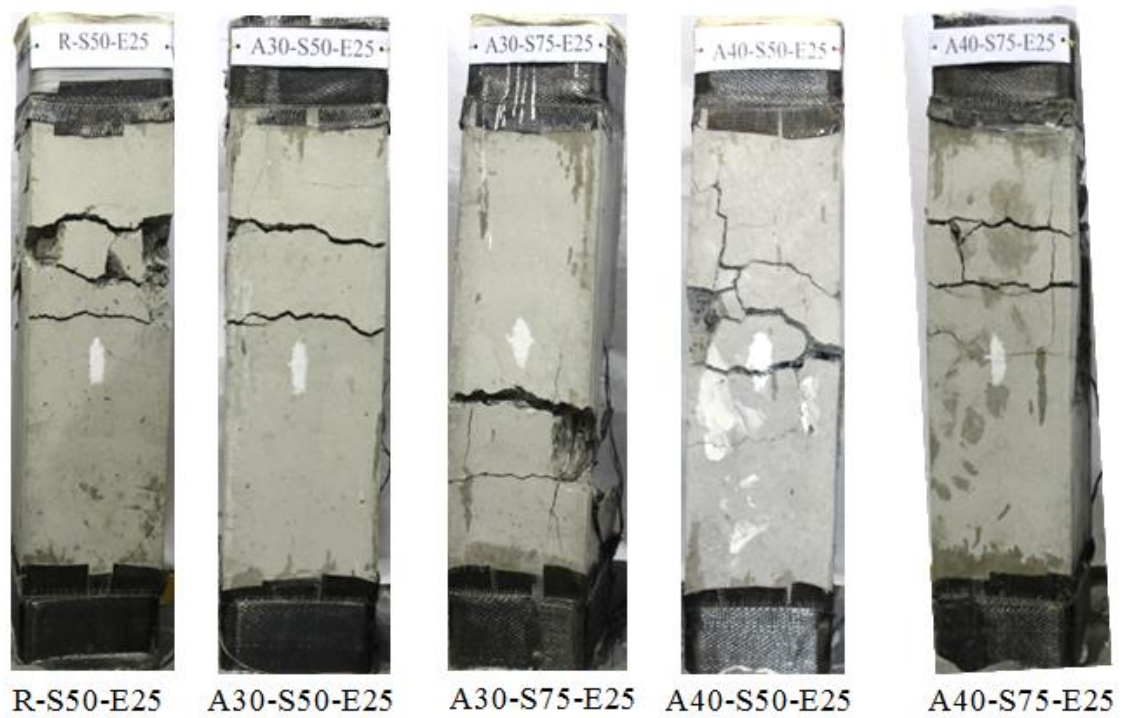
Behaviour of Specimens under 25 mm eccentric axial loads: Tension side
